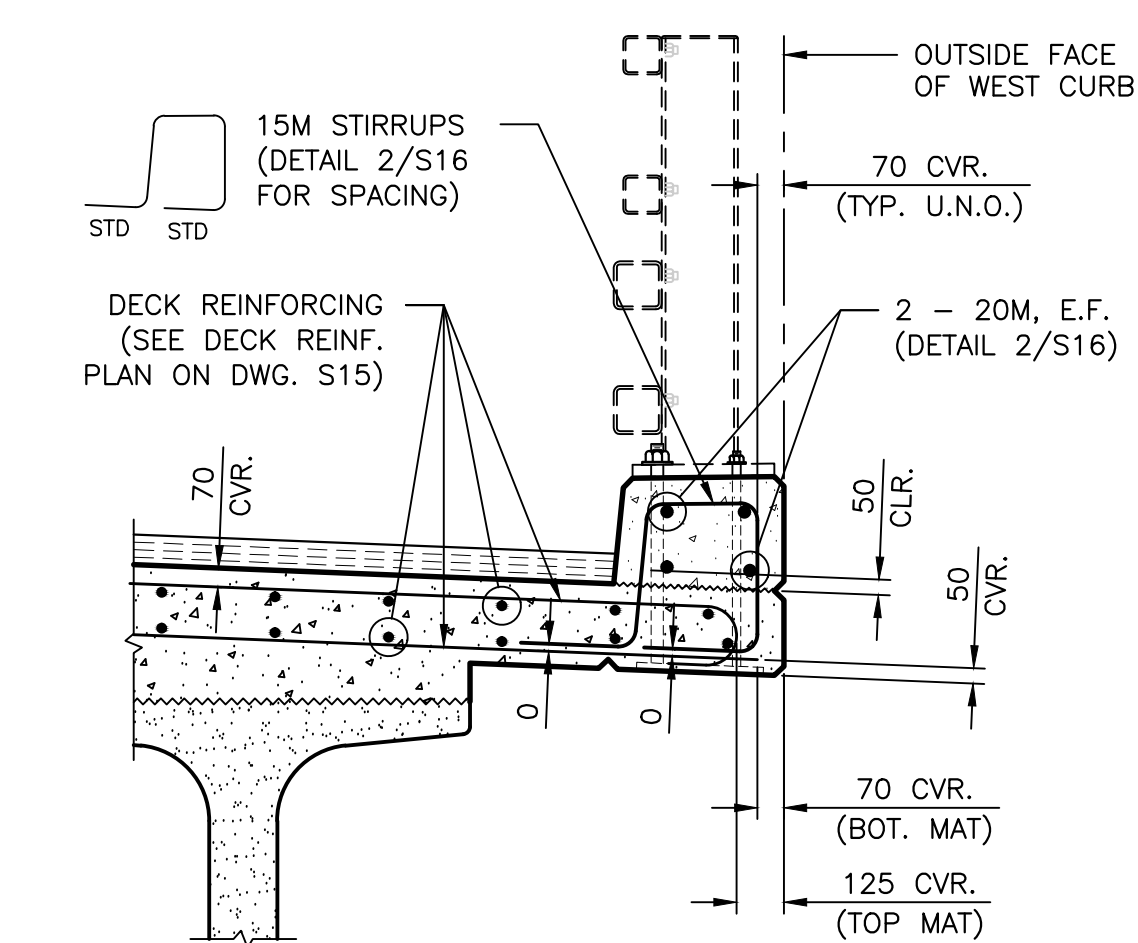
DETAIL - WEST CURB REINFORCING PLAN (2) S15
